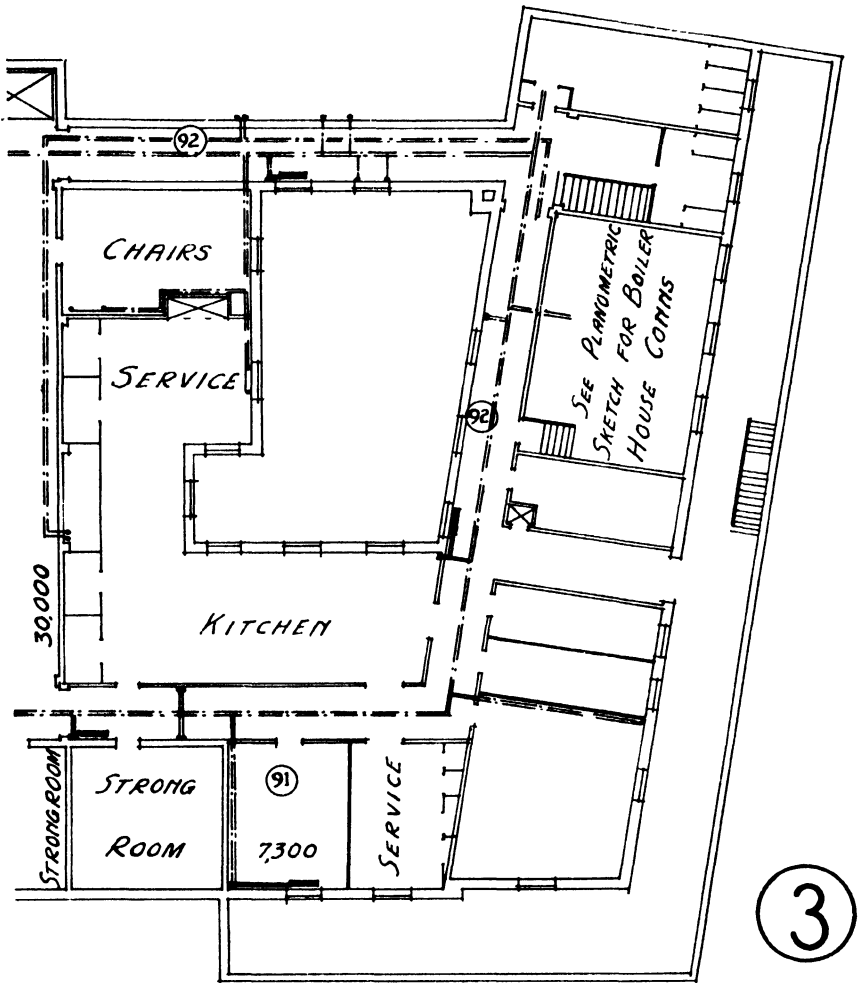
c. Basement plan showing heating system in Town Hall building.
